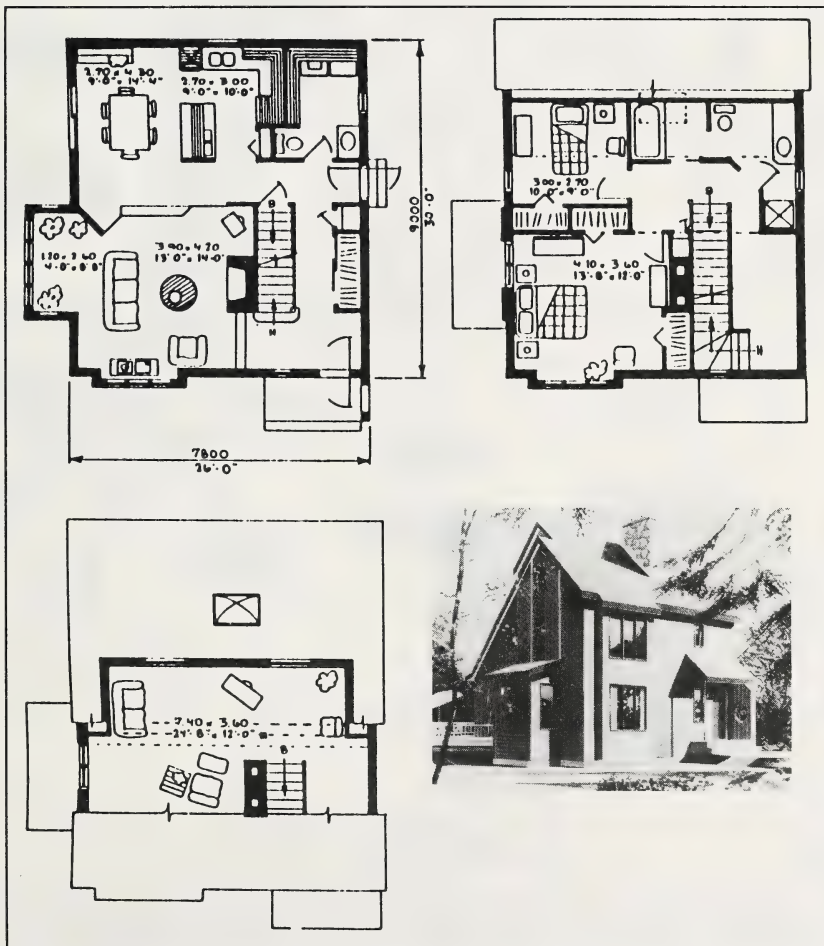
Floor plan for a house. Courtesy *Select Homes and Food*. Drawings, René Cayer, Les Dessins Drummond, Inc.
